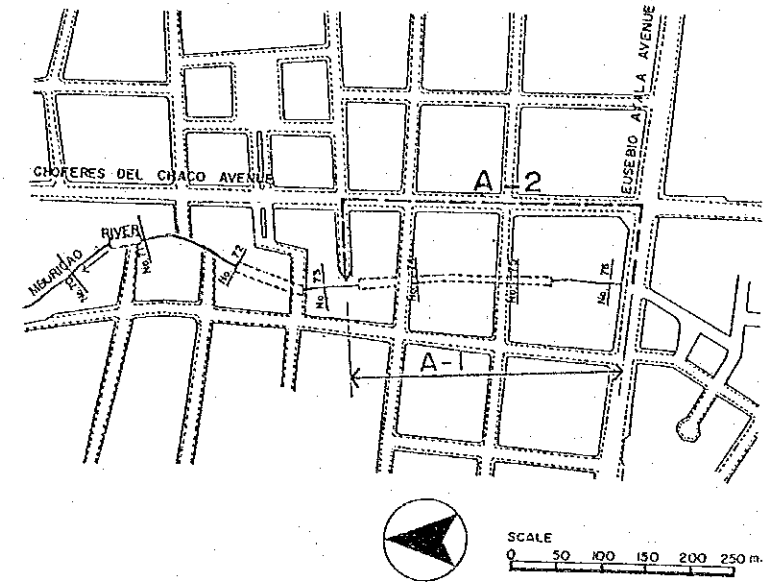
LOCATION OF ALTERNATIVE PLANS
